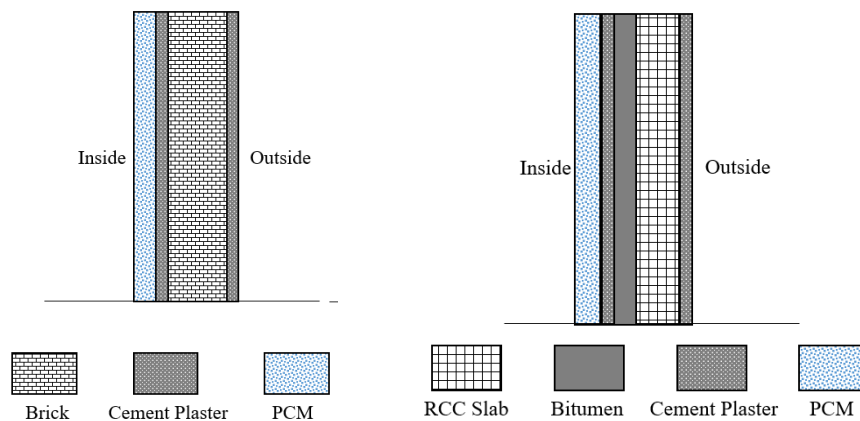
Best Location for PCM Placement a) Walls b) Roof
